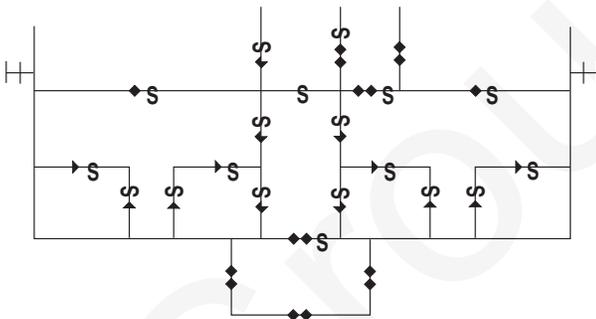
(a) Symbols Used to Note Wall Ratings and Parapets on Life Safety Plans and Risk Analysis Plans and Cross-Sections.
